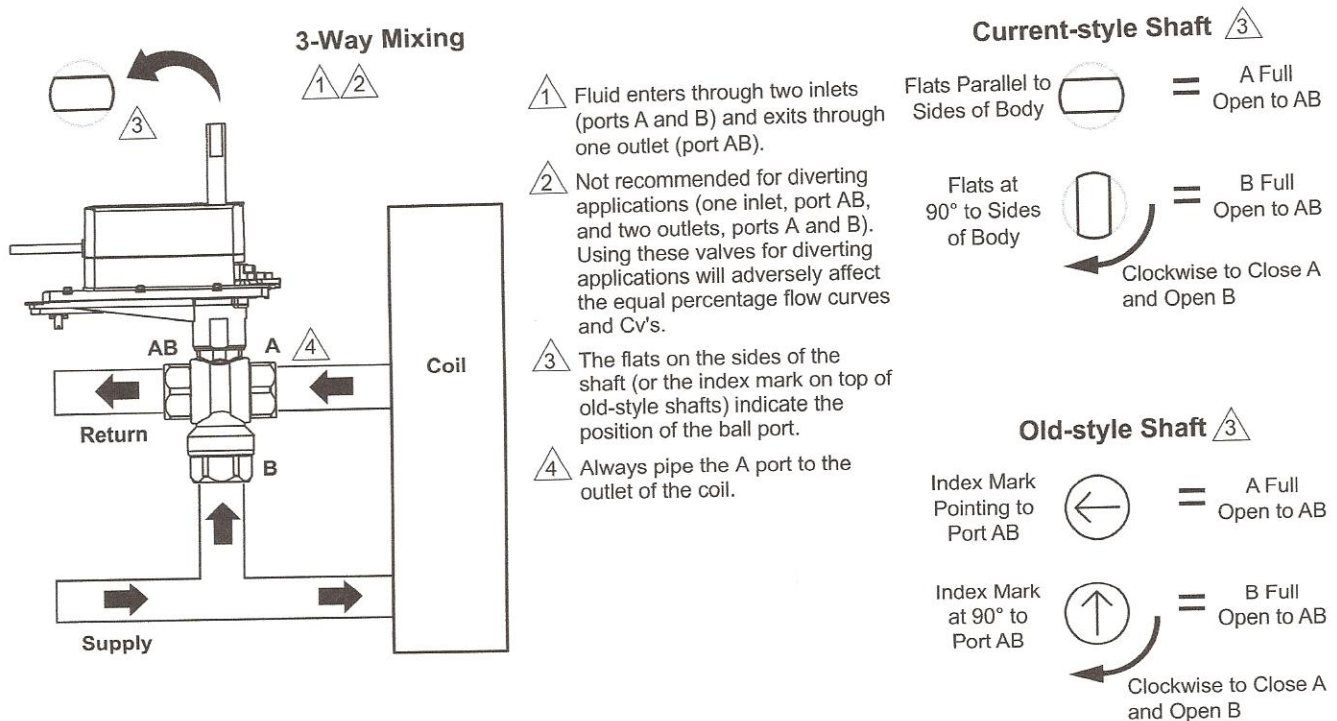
3-Way Mixing Valve Assemblies Piping Diagram.
